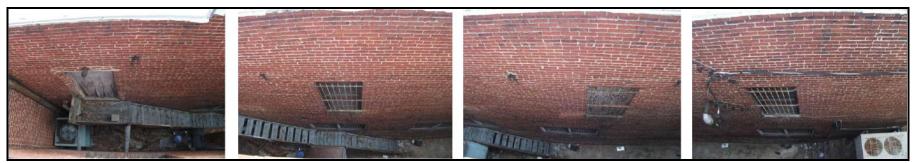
Existing West Elevation – As viewed looking down from adjacent rooftop
